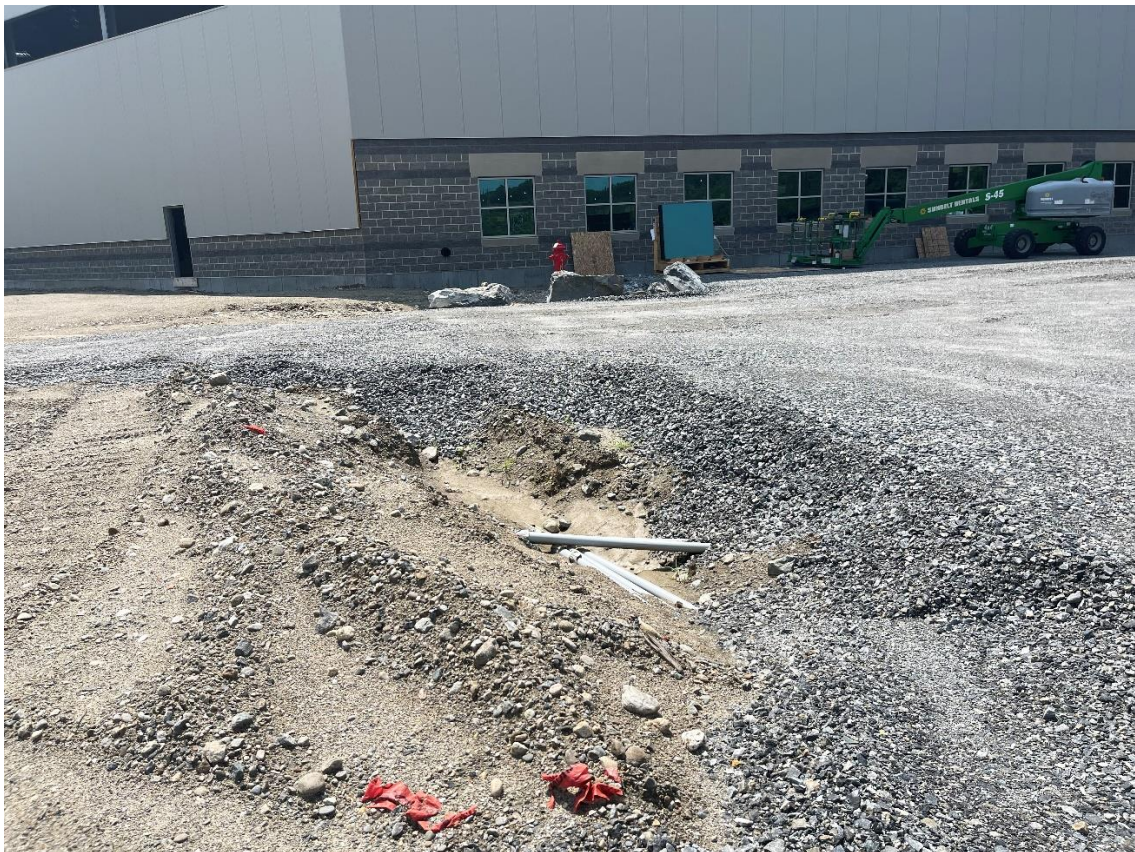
Near the northeastern corner of Building 3, utility pipes were uncovered.
